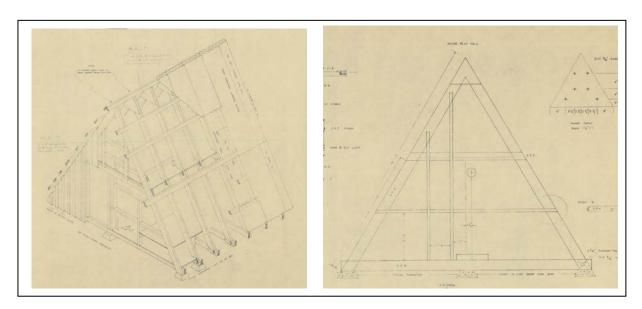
A-Frame Structural Detail from Hunter Cabin -'A' Frame 1962
